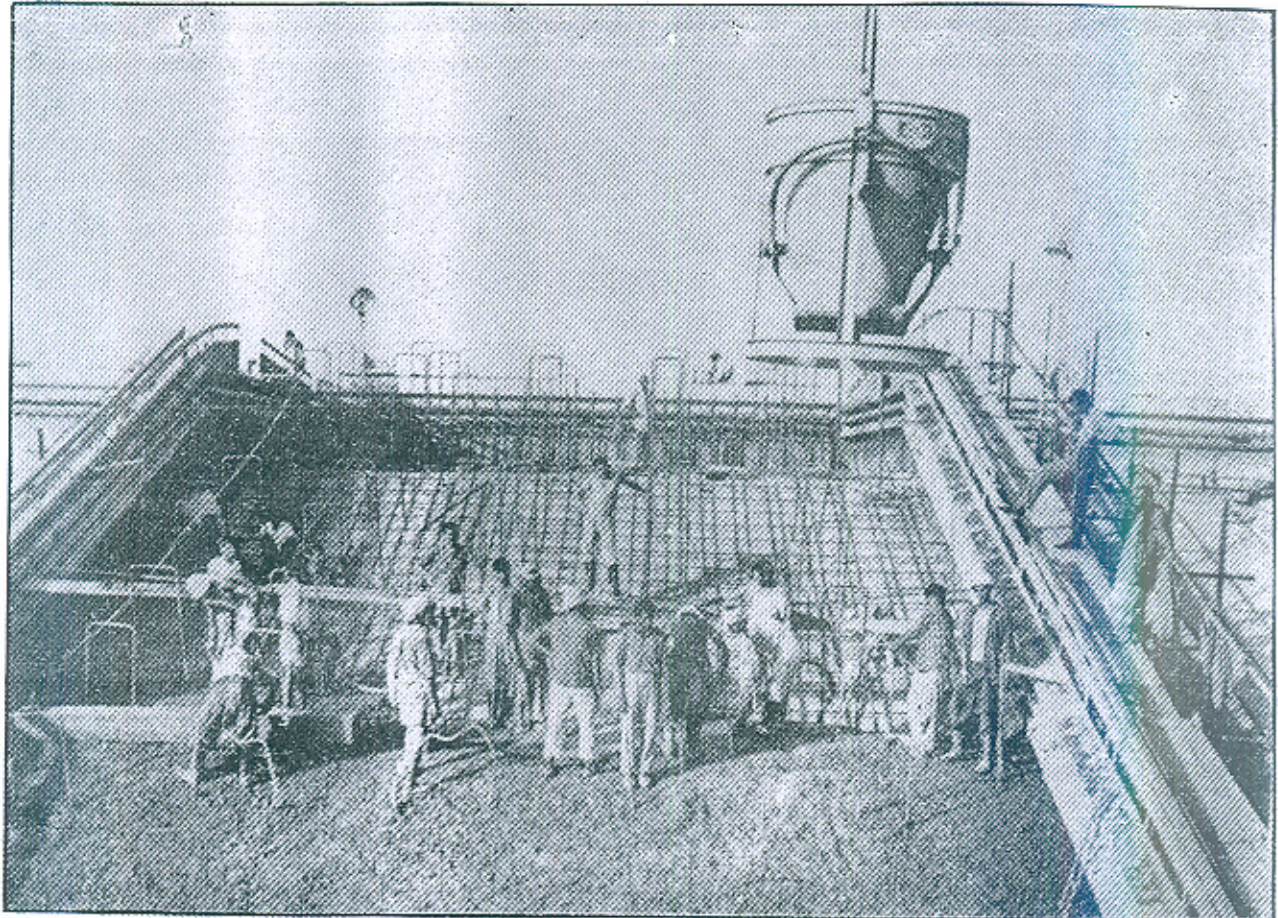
Placing concrete by skip and vibrating with poker vibrators in the central floor of Rasul barrage
